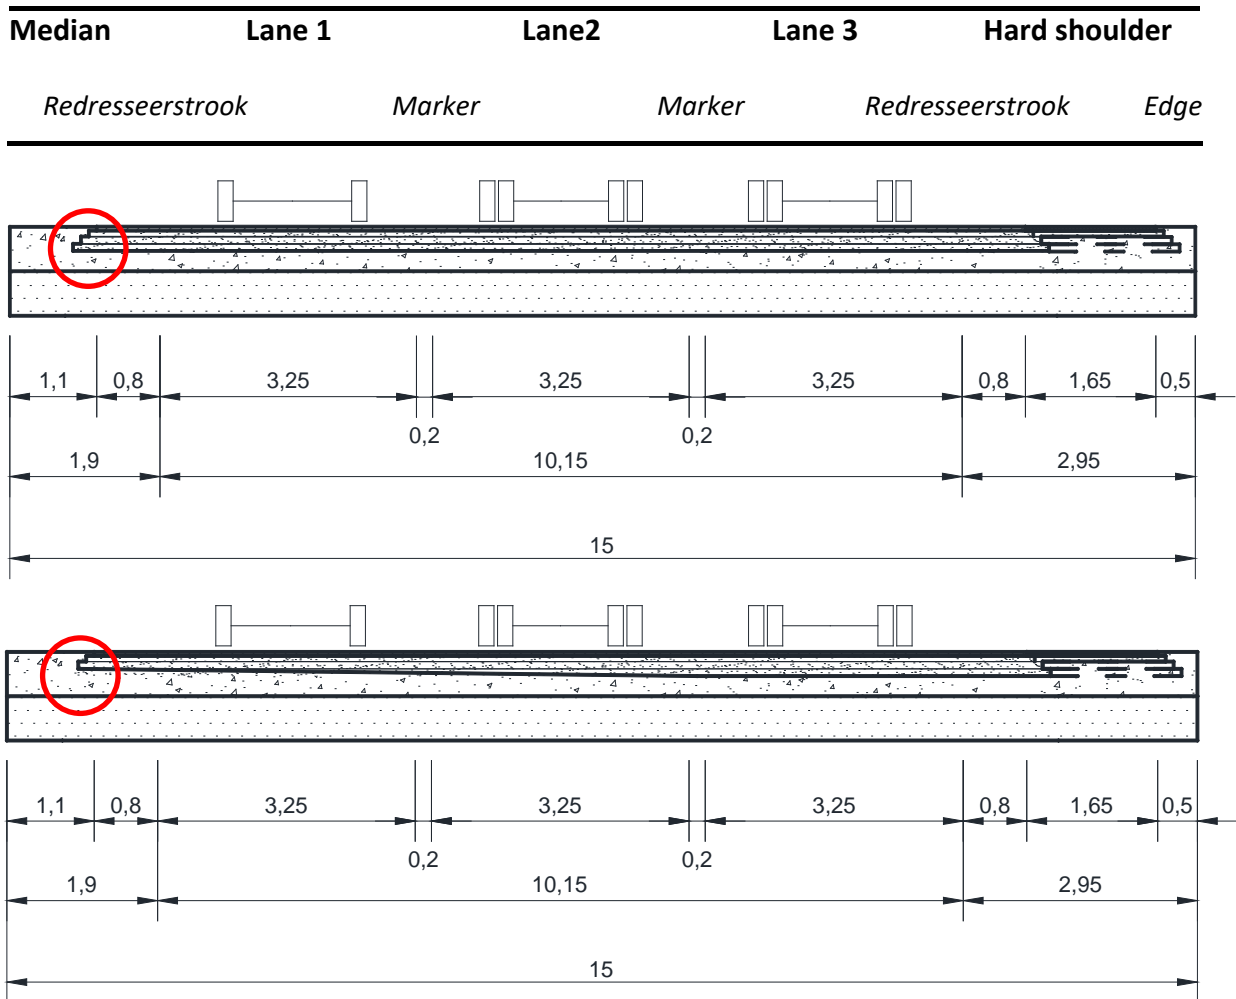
Original (up) and New (down) dimension design of the model (Cross section, m)
